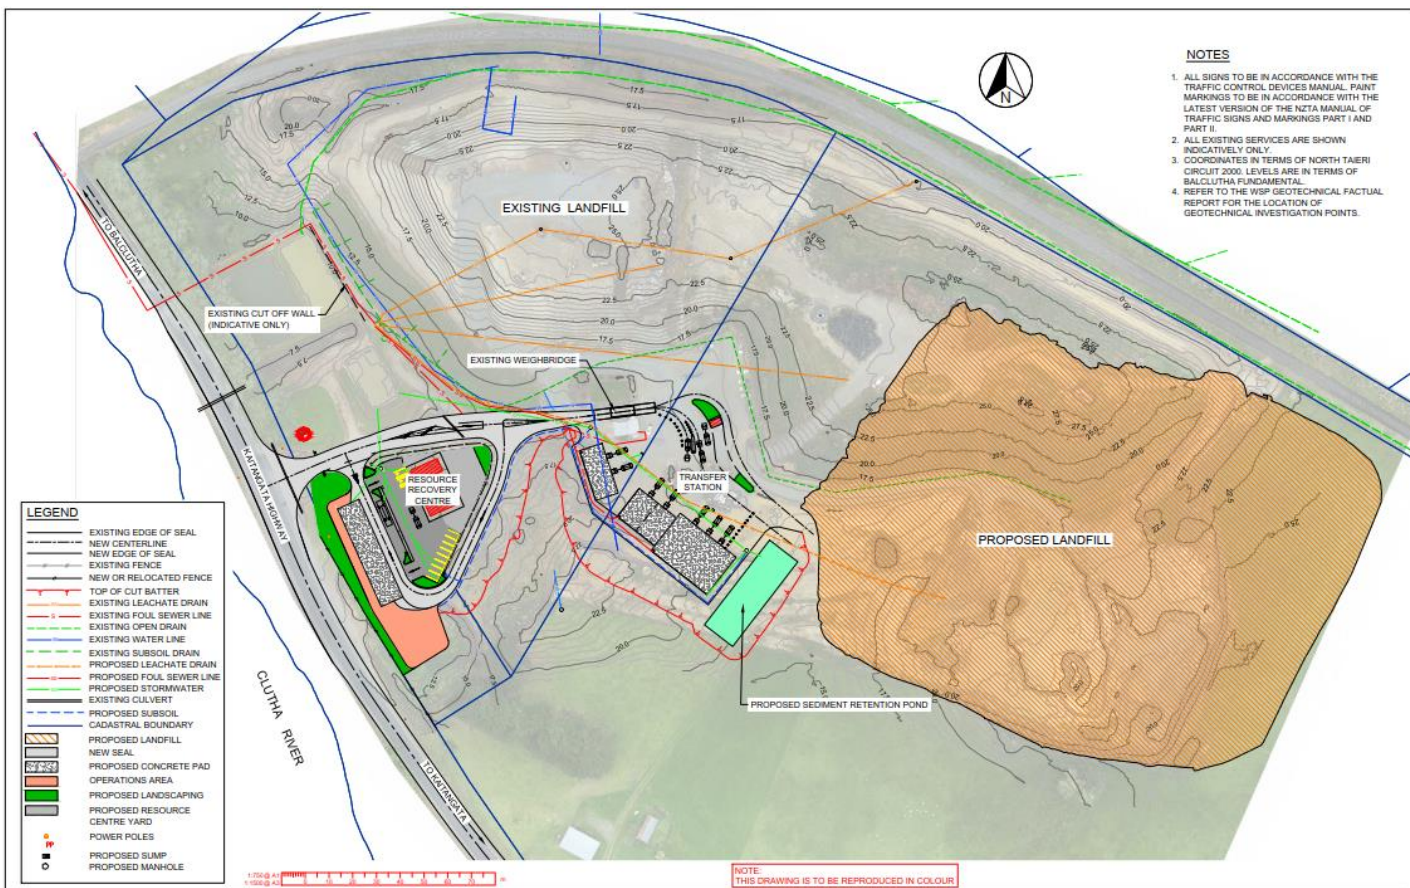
Design plan showing the general layout of the proposed new cells at the landfill.
